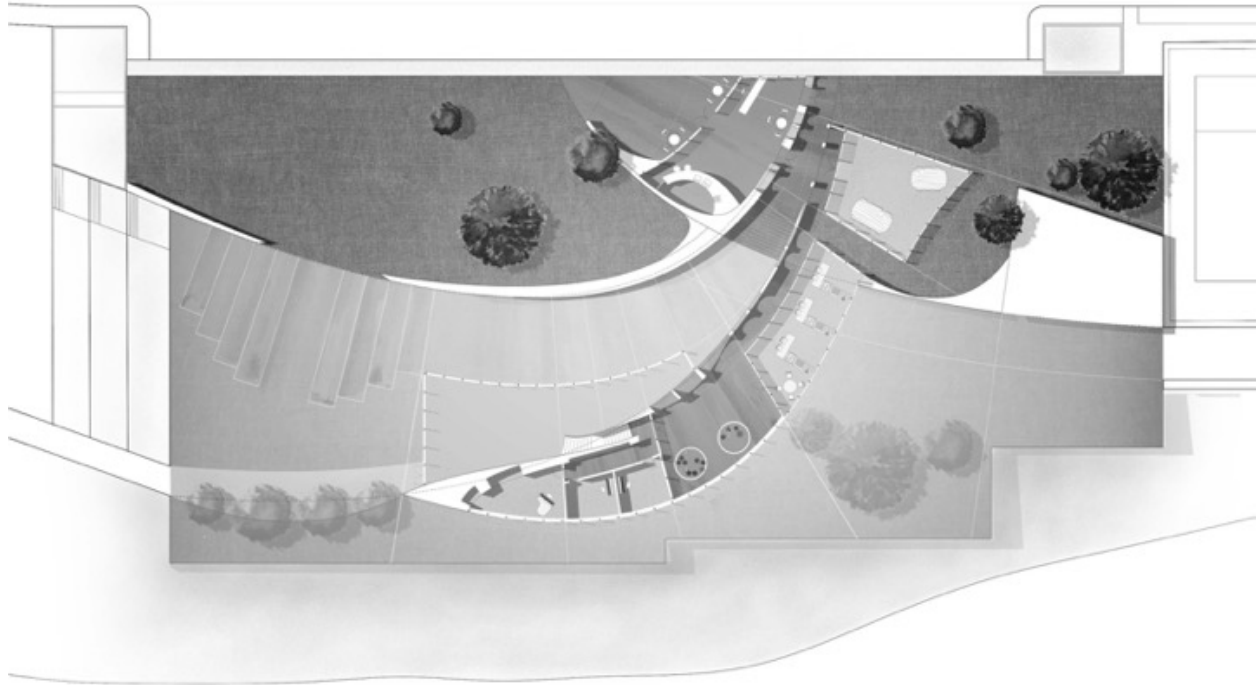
Ground floor plan of Julie Kress' architectural proposal
